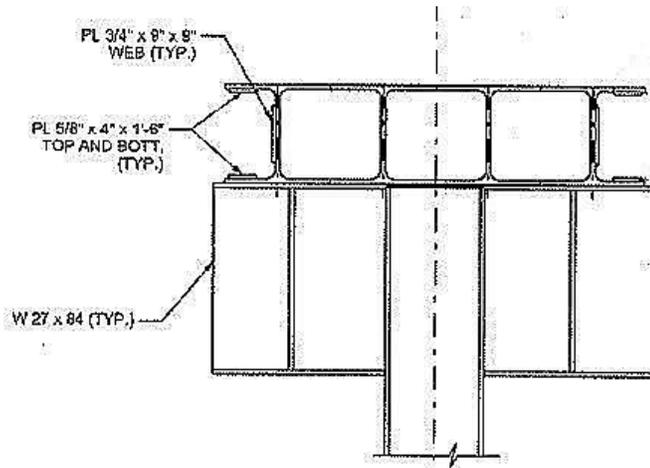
End view of the I-80 at Wanship pile top design with abutment and end approach bracing for the WB and EB bridge
